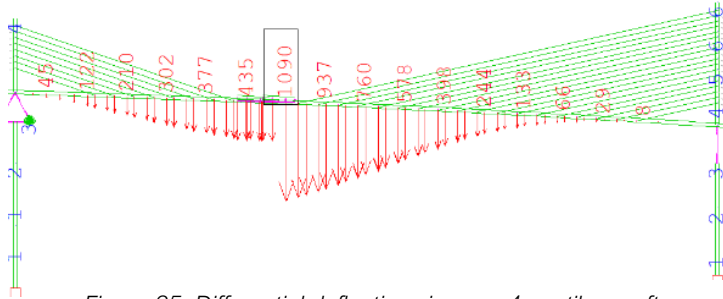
Differential deflections in span 4 cantilever after casting segment 23 (and before stressing cable 17)
